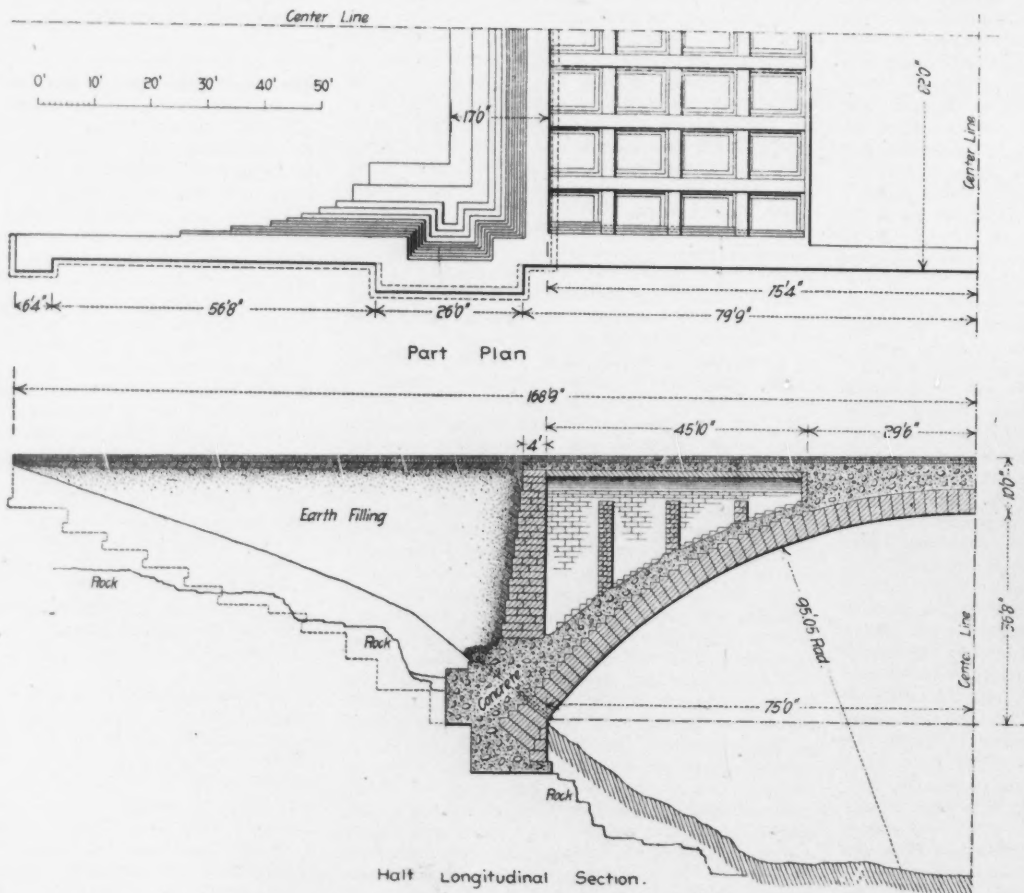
PART PLAN AND HALF LONGITUDINAL SECTION.
